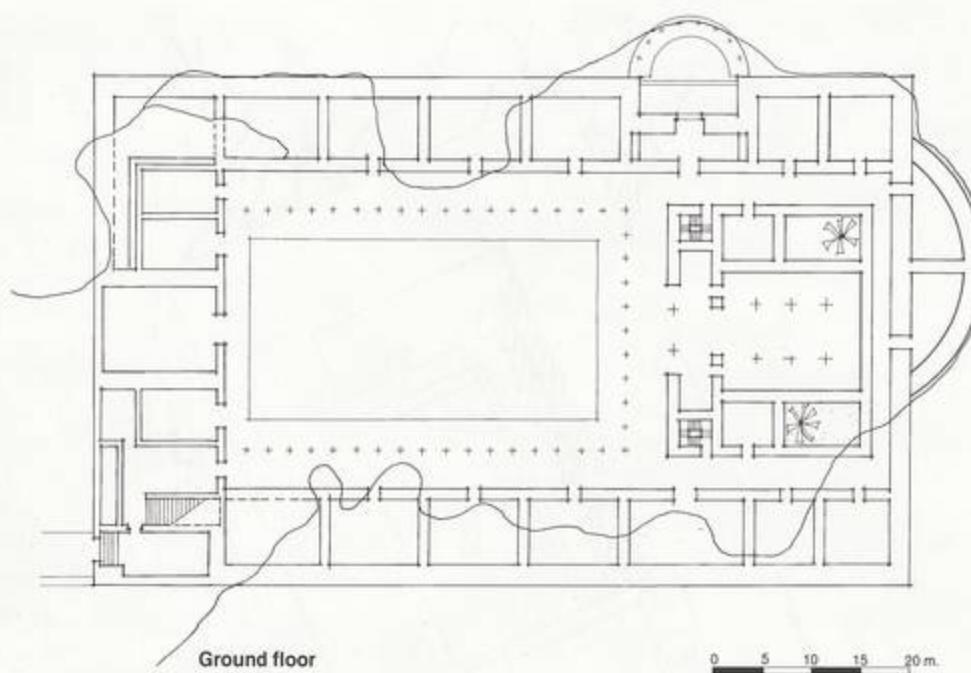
Reconstructed plan of the Promontory Palace, ground floor. West to right. All drawings and plans are by the author
